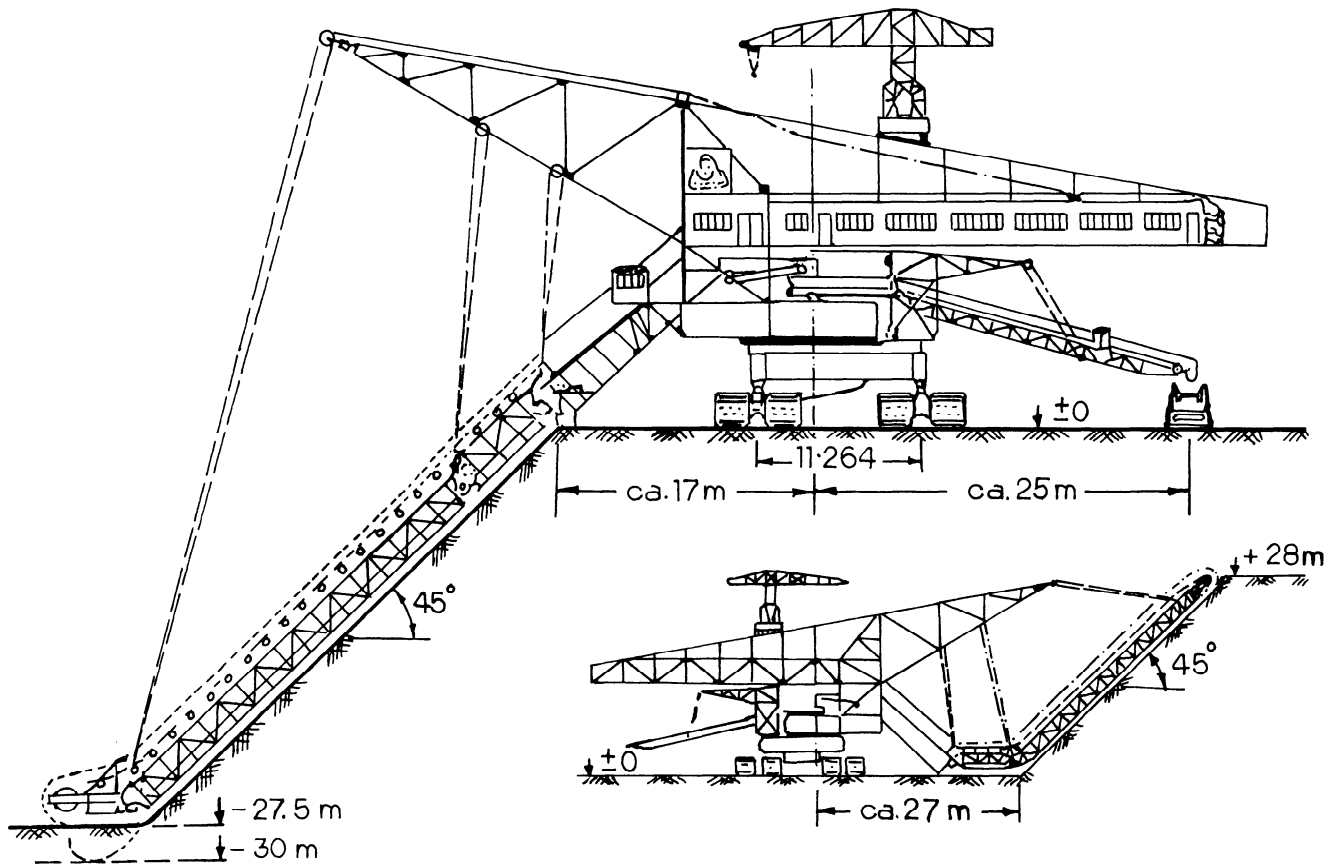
Bucket chain excavator (courtesy: Friedrich Krupp GmbH Maschinen und Stahlbau Rheinhausen).
